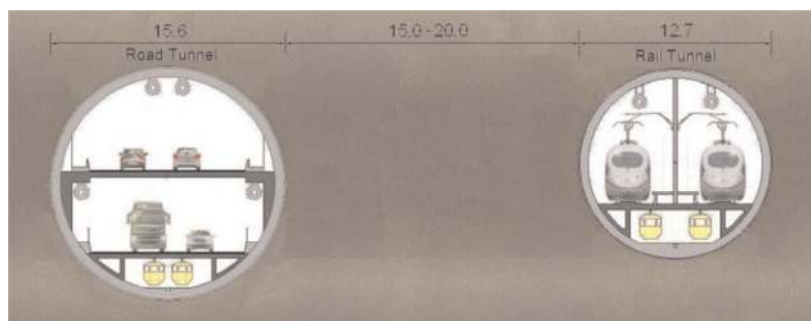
Optimized TBM tunnel alternative. Current cross-section.
